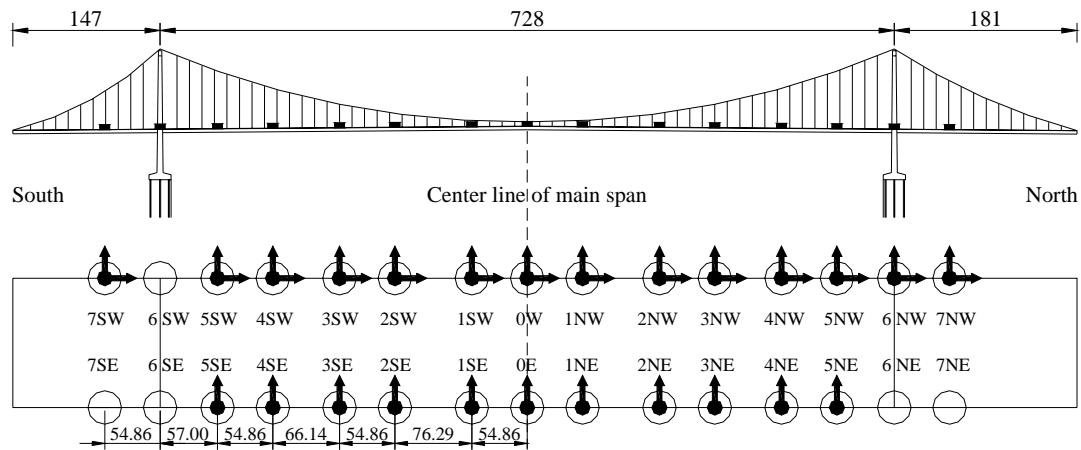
Layout of accelerometers along the bridge deck (unit: m)
